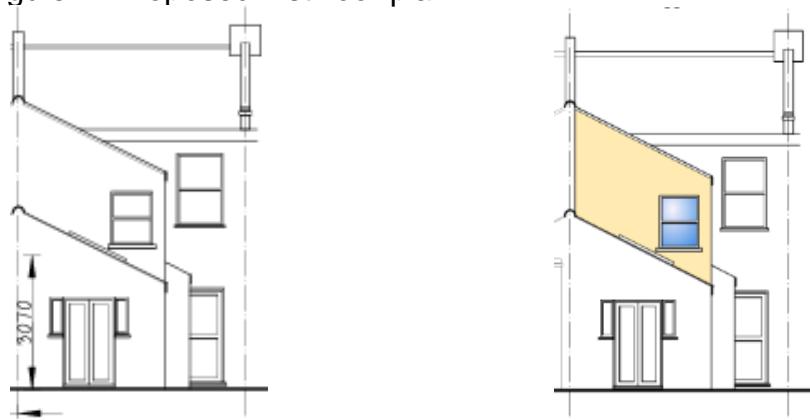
Existing elevation plan (left) and proposed elevation plan (right)
